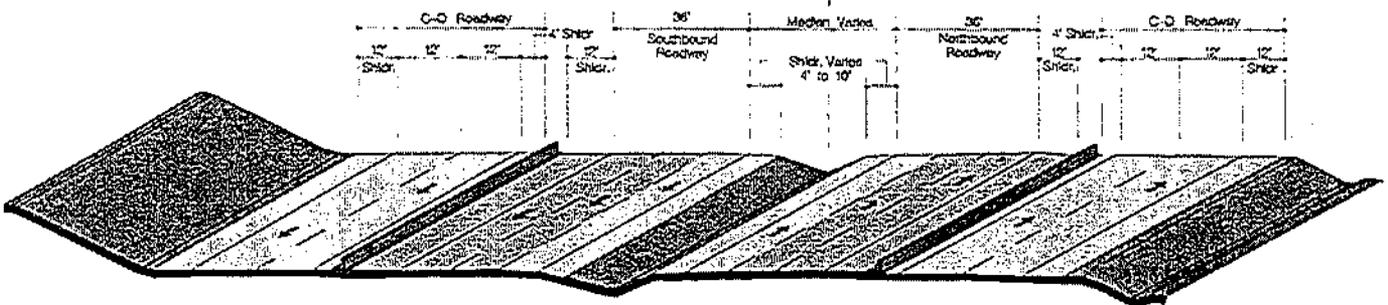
Typical Sections Alternates Retained for Detailed Study
